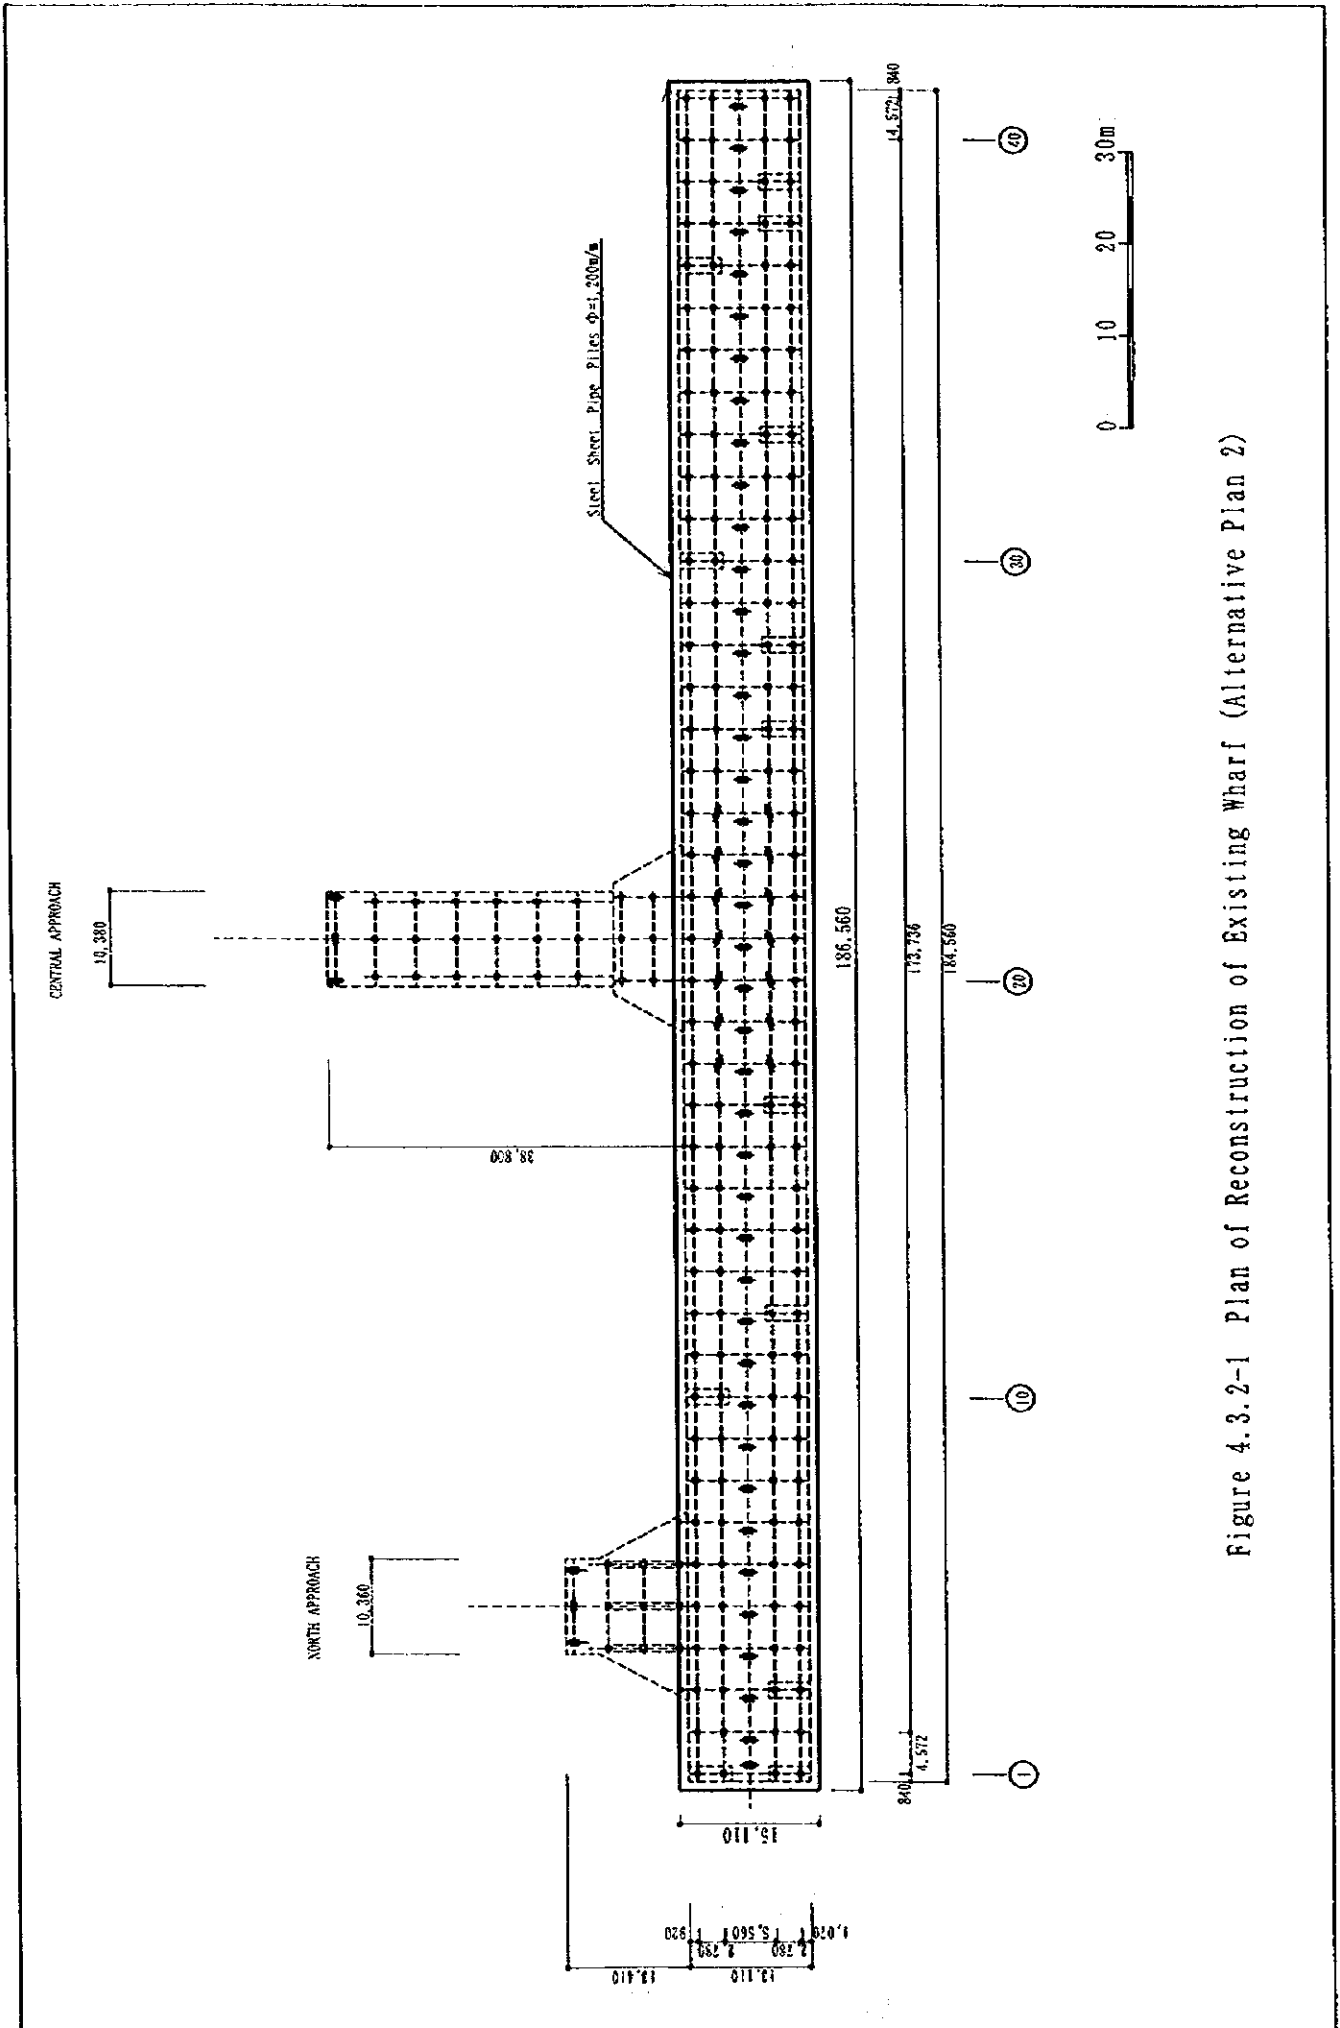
Plan of Reconstruction of Existing Wharf (Alternative Plan 2)
